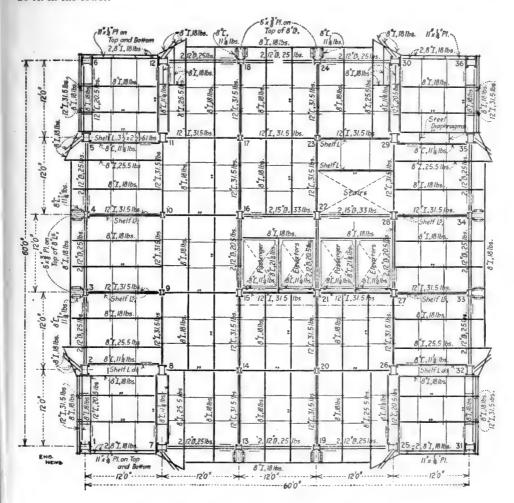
TYPICAL FLOOR PLAN OF SINGER TOWER.
